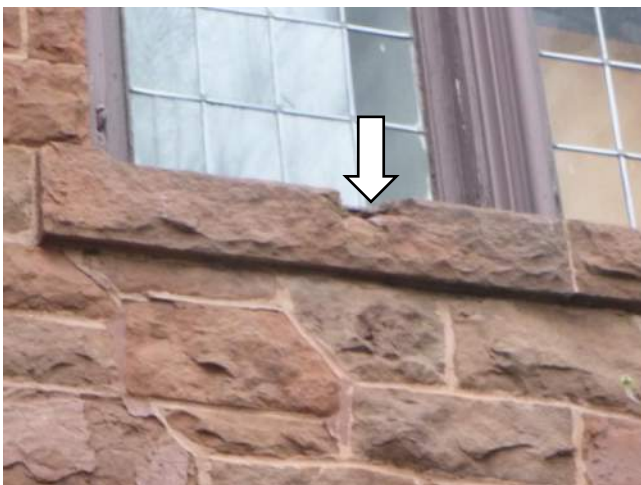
View of a spall in the stone sill of a window on the Egleston building.
